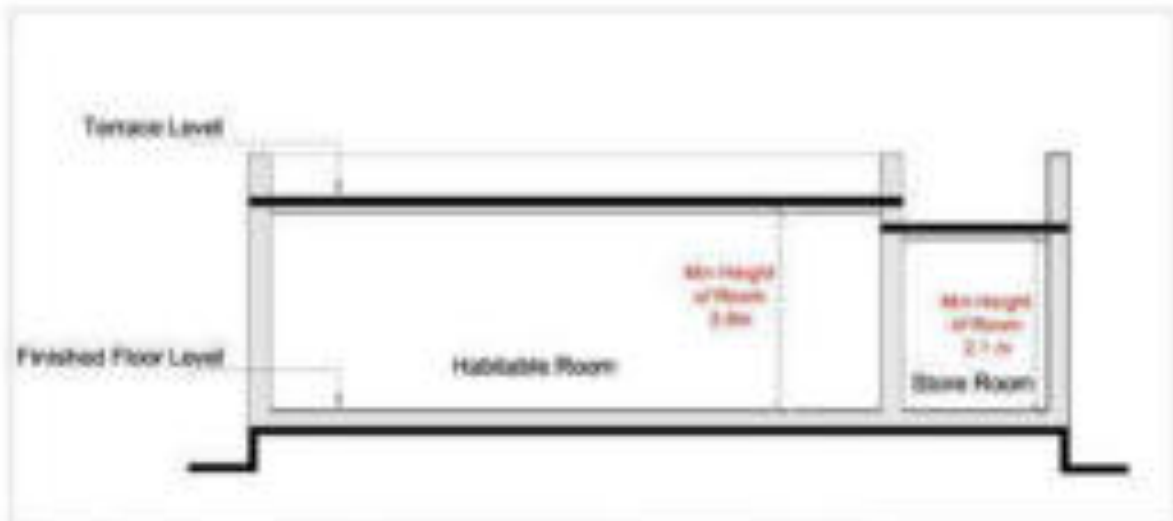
Minimum Clear Height for Dwelling Unit: Commercial Building
